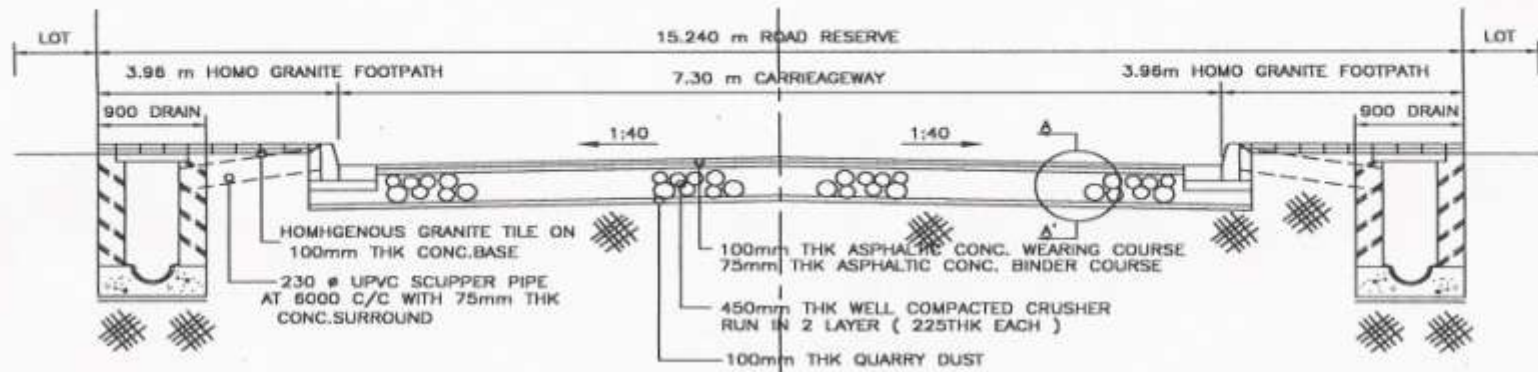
DETAIL OF ROAD PROPOSED CONSTRUCTION DESIGN OF K-G.S.C. METHOD FINE & NORMAL SOIL CONDITION
